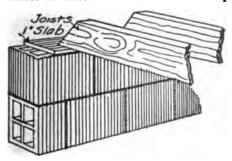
In Preparing a Hollow Tile Wall for Floor Joists, Bed Plates or 1-inch Slabs Are Laid Along the Top of the Wall to Form a Bearing Surface. These Tiles Are Also Used to Build Wall Up to the Proper Floor Heights
